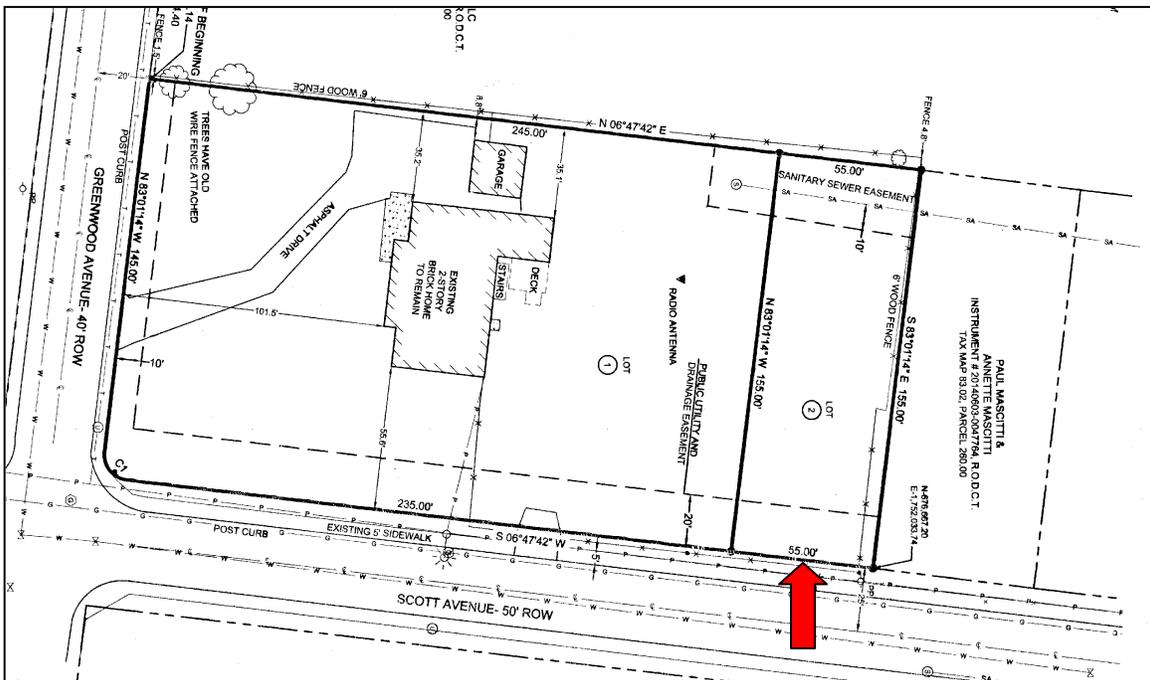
The plot plan for 403 Scott, showing how it was subdivided from 1929 Greenwood Avenue
